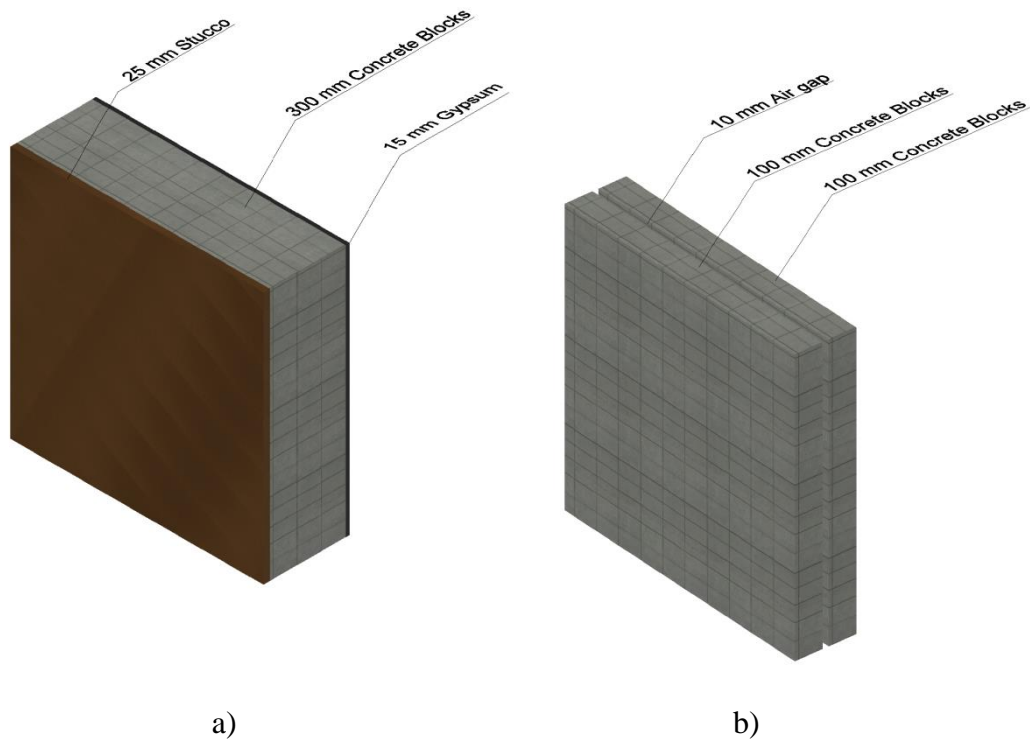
a) Exterior wall layers; b) Interior wall layers
